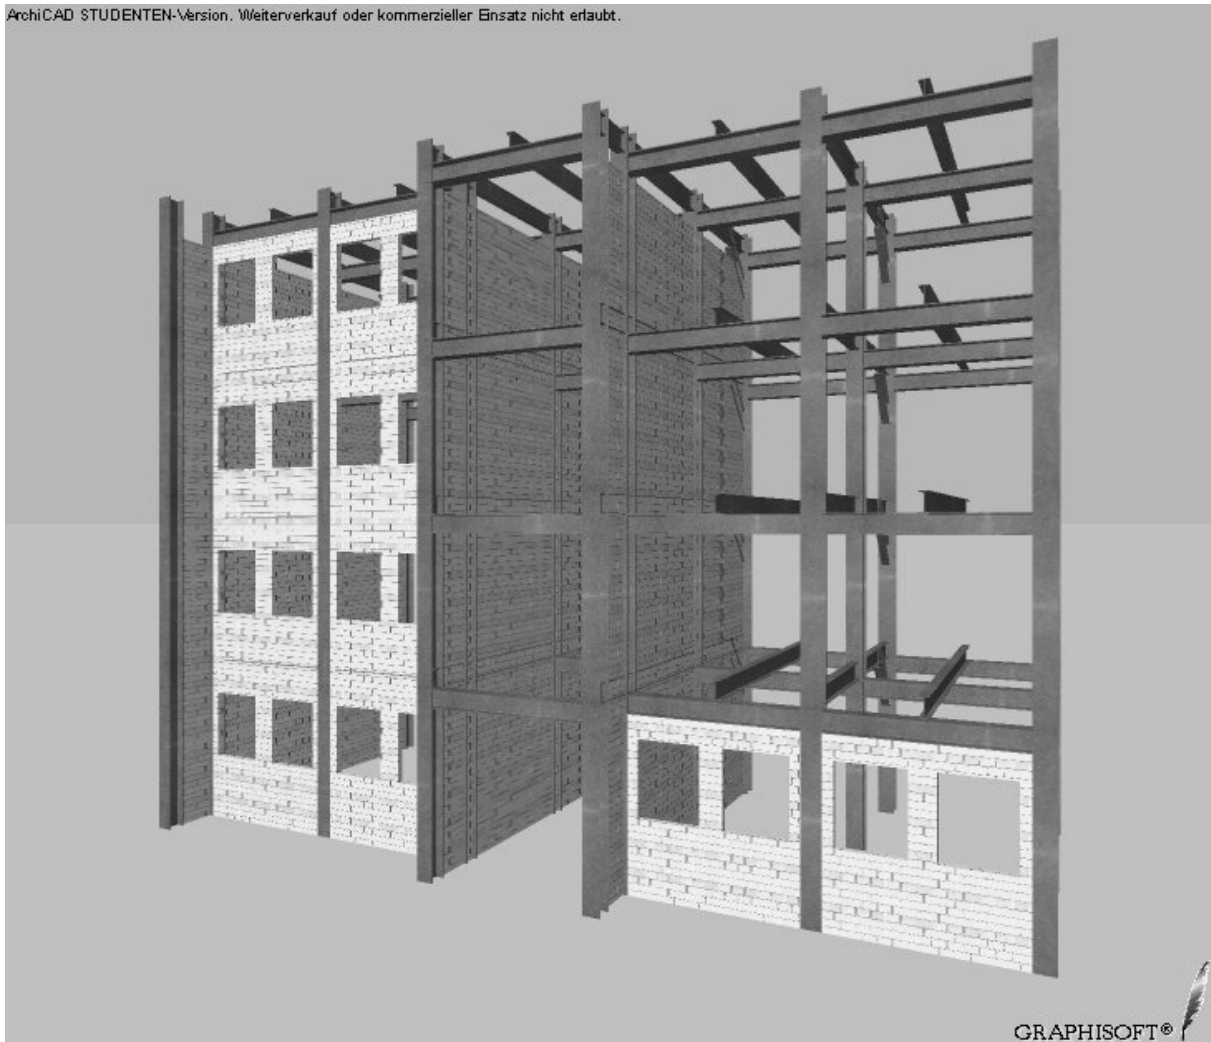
Highrise building of the type during the building process. (archive photo presenting such a succession in the construction process can be seen on the example of Kassel-Rothenberg, architect Otto Haesler, in Haesler: Mein Lebenswerk als Architect. 1957, on page 33)
